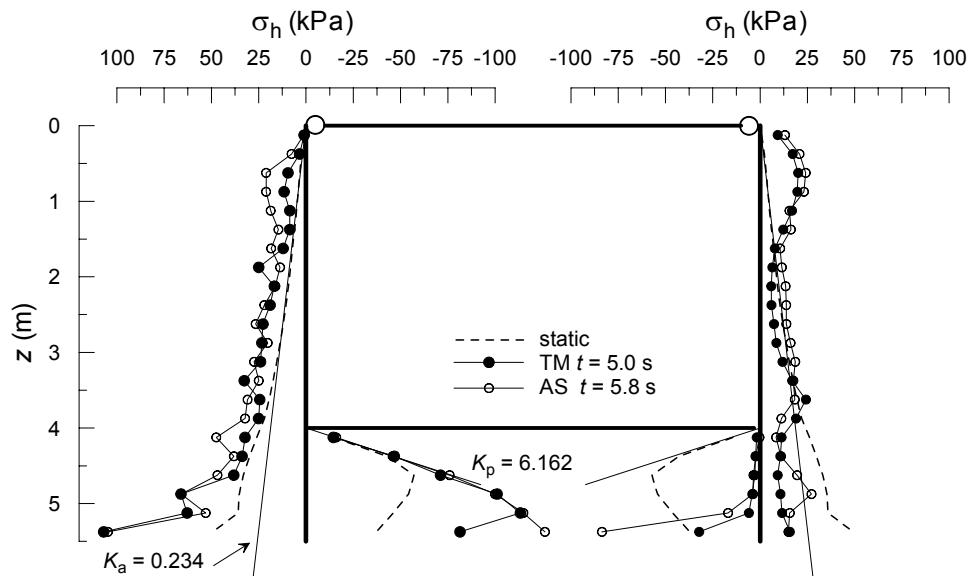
Contact stresses acting against a pair of propped retaining walls (Callisto et al. 2008).
